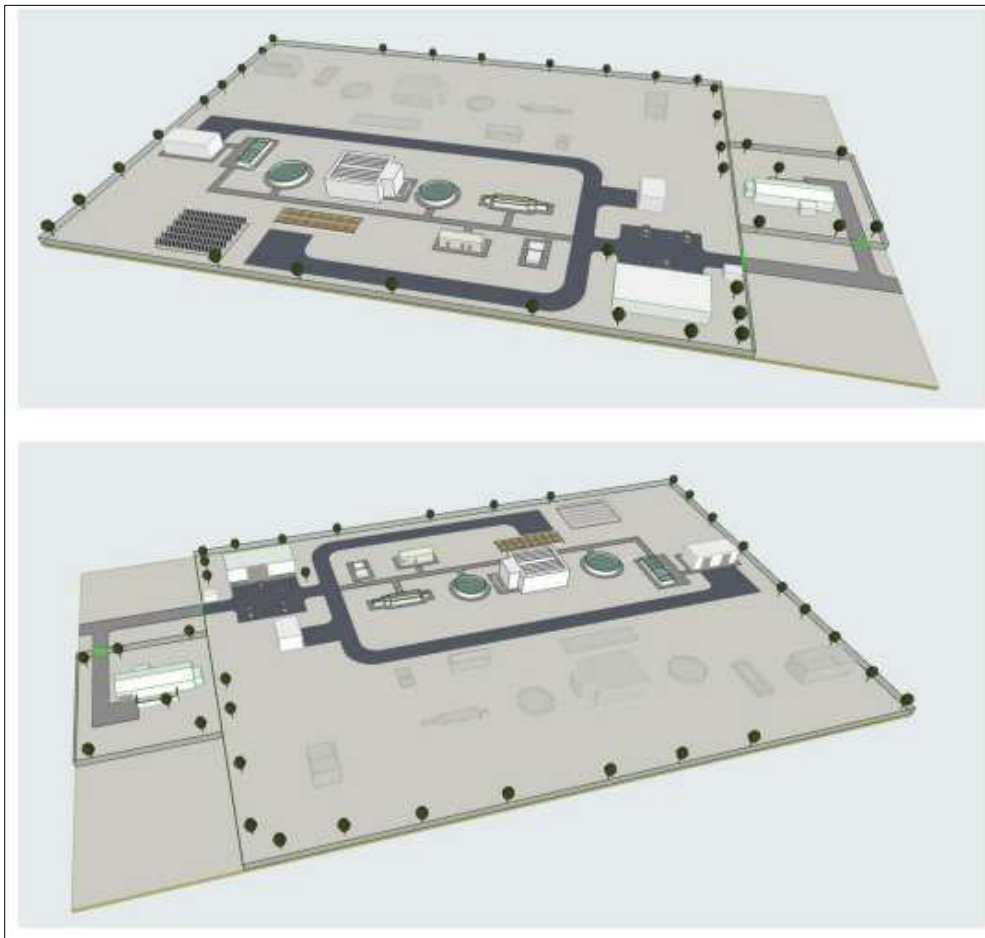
The project site concept drawings (Trinitas Consulting Engineers, 2024)
